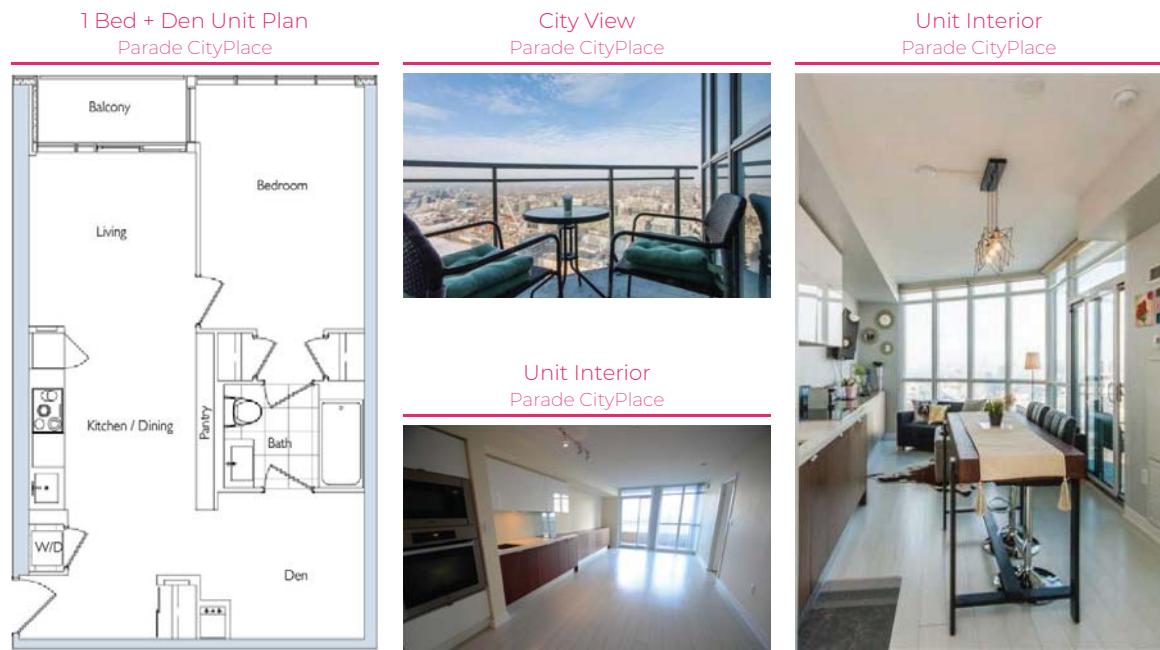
Unit plan and views of a typical one-bedroom plus den unit at Parade CityPlace in downtown Toronto
